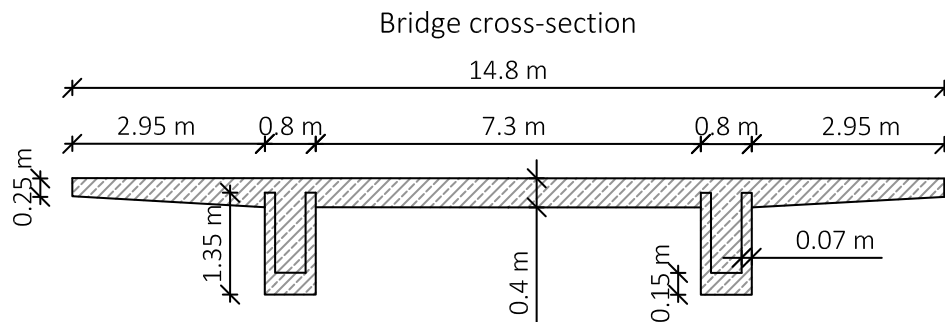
Selected cross-sections used for the redesign of the existing A2.Ü22a Overpass
